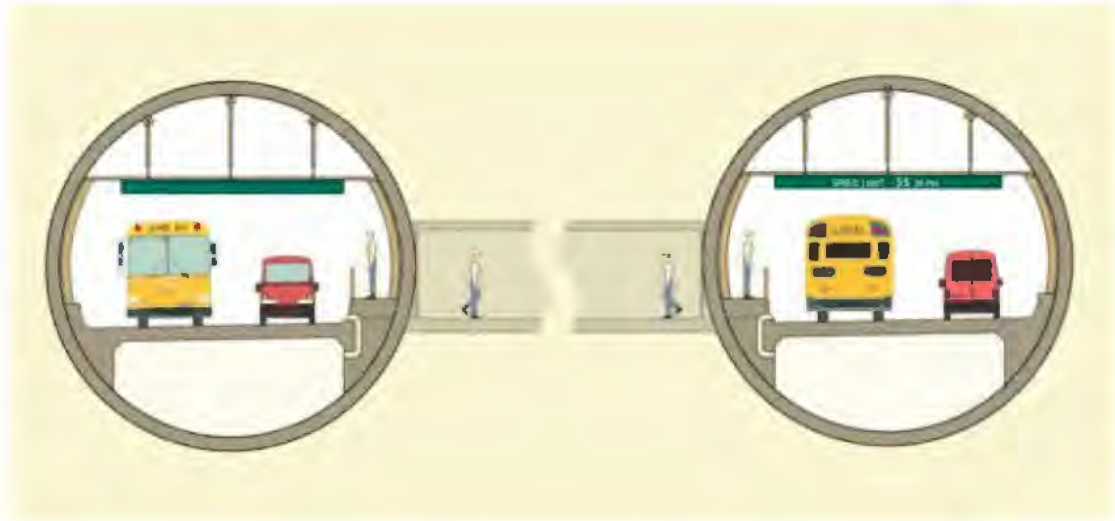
Typical cross-section: twin tunnel alternative with cross passage connections for emergency egress.
